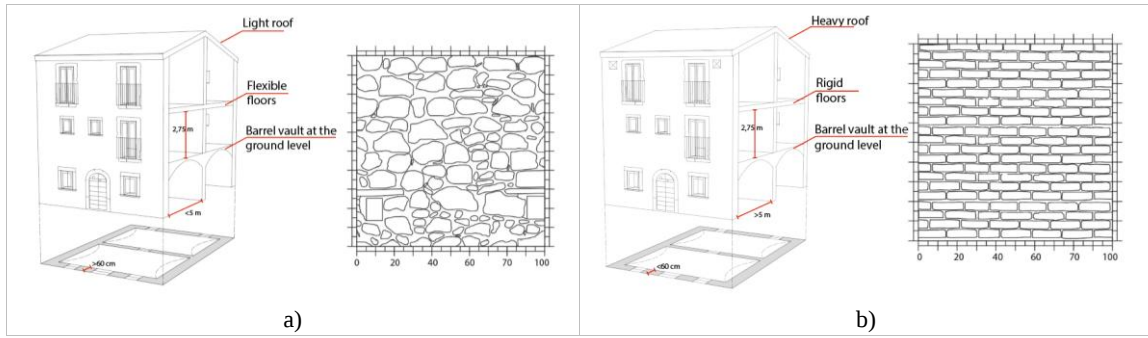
Ideal 3d models and masonry patterns of a) archetype building AB#1 and b) archetype building AB#11.
